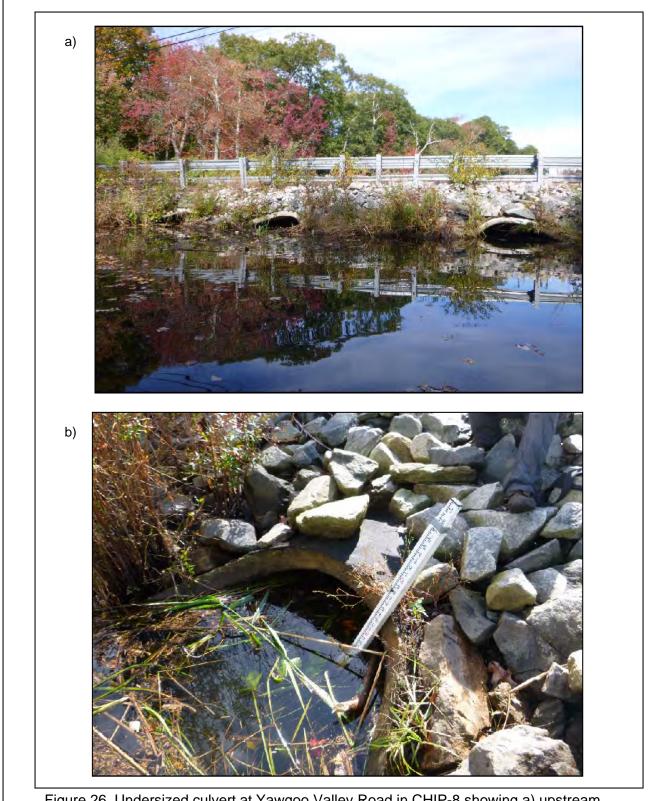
Undersized culvert at Yawgoo Valley Road in CHIP-8 showing a) upstream view of entire crossing and b) close up of beaver dam clogging culvert inlet.
